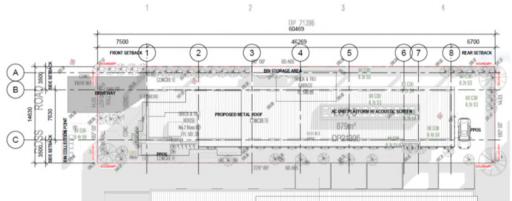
Site plan (Prepared by Alvic and Partners Pty Ltd)
